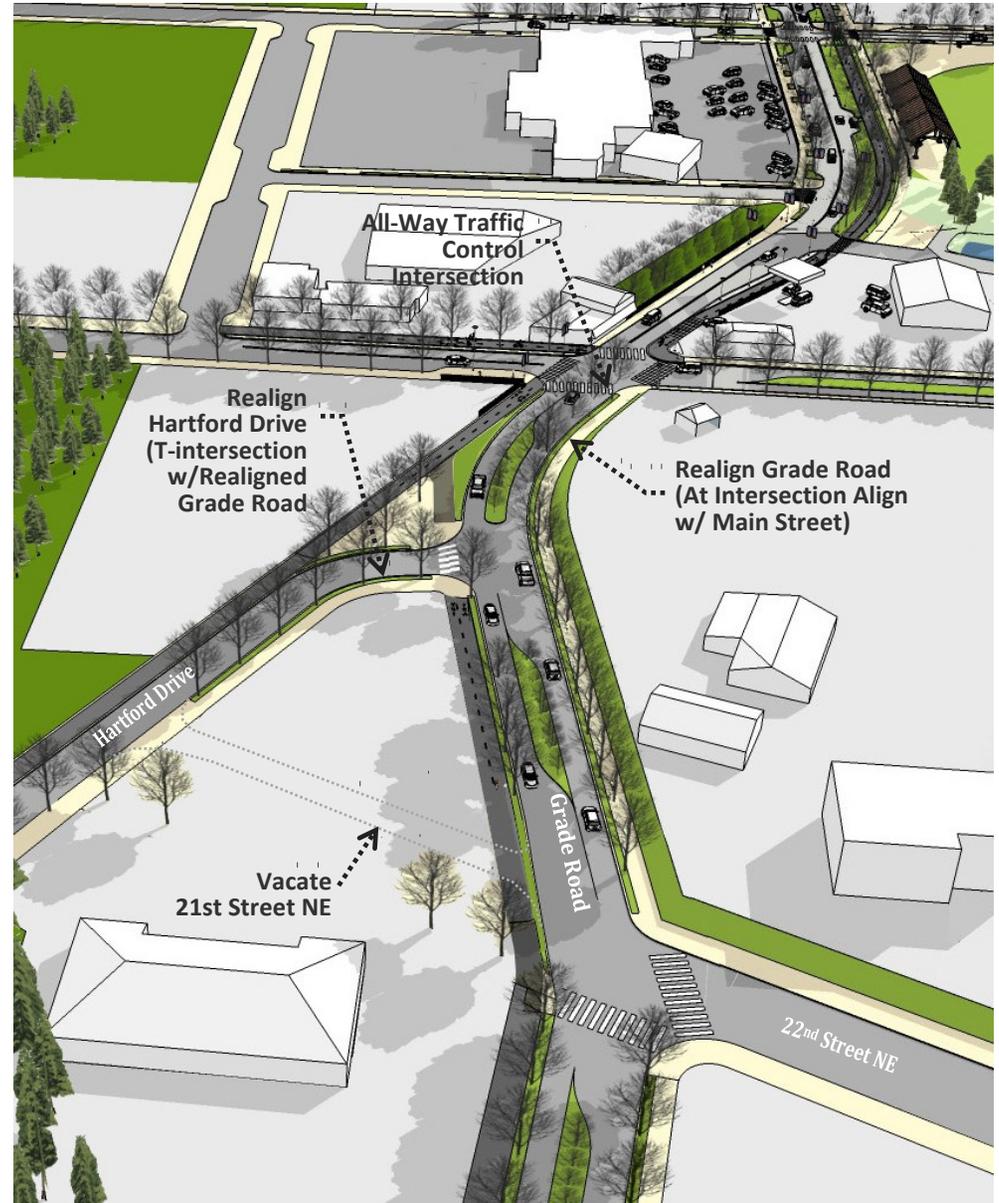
'Front Door' Entry—Road and Hartford Road Realignment (View Looking South Between 22nd Street NE to 20th Street NE)
